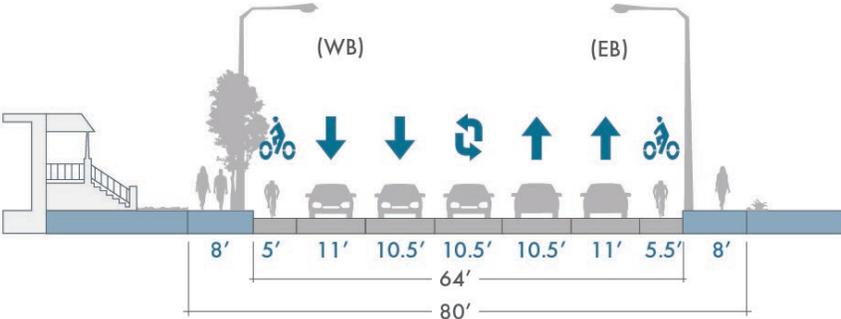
Proposed Street Section, Chapman Avenue: Placentia Avenue to Walnut Avenue, Bradford Avenue to Angelina Drive
